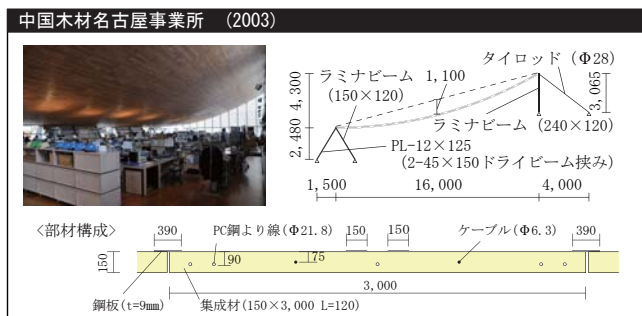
Example of Integrated-Type Hanging Roof Made of Timber
